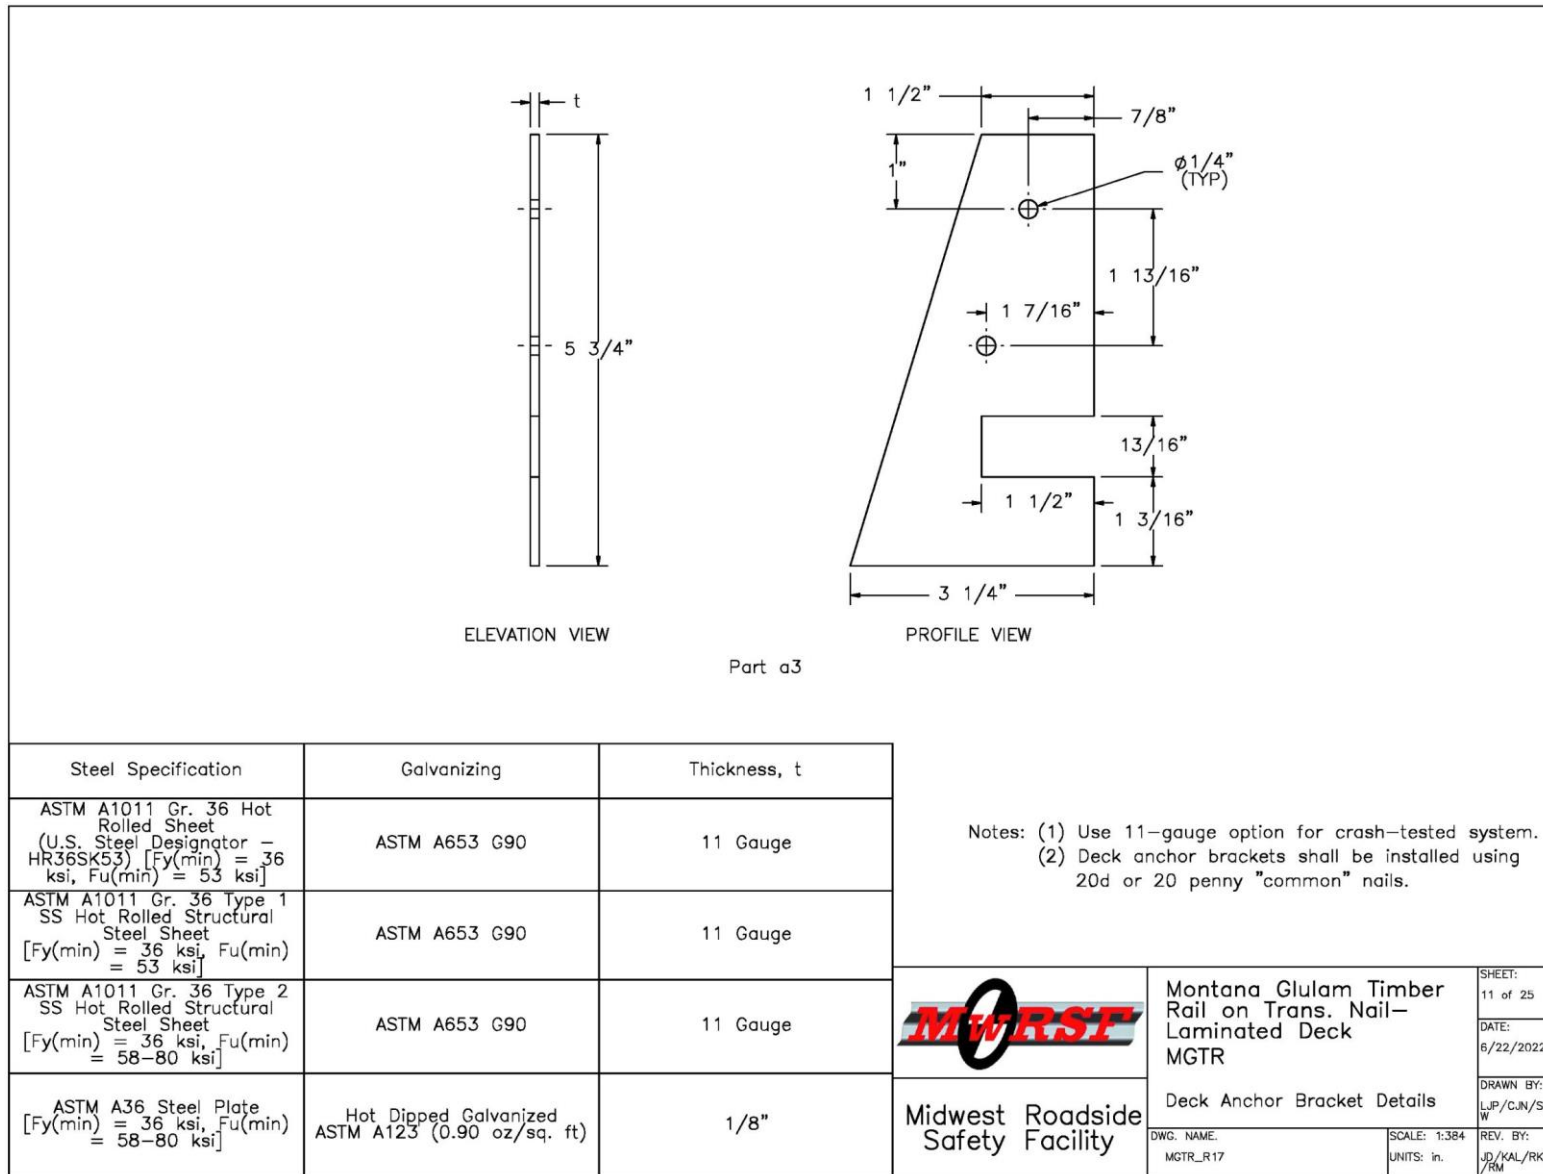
Deck Anchor Bracket Details, Test Nos. MGTR-1S and MGTR-1D
